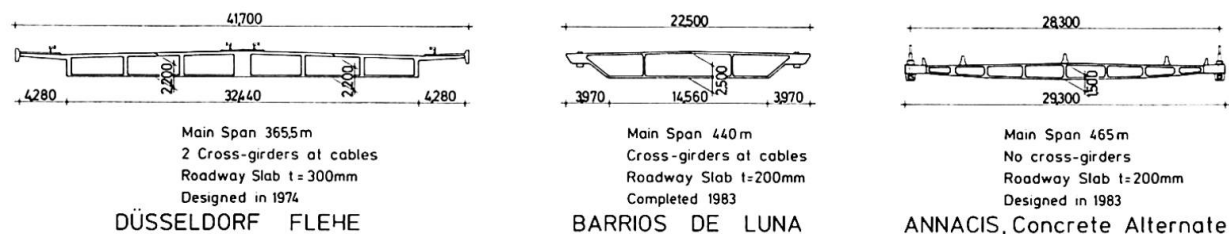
Cross-sections of long-span cable-stayed concrete bridge beams
